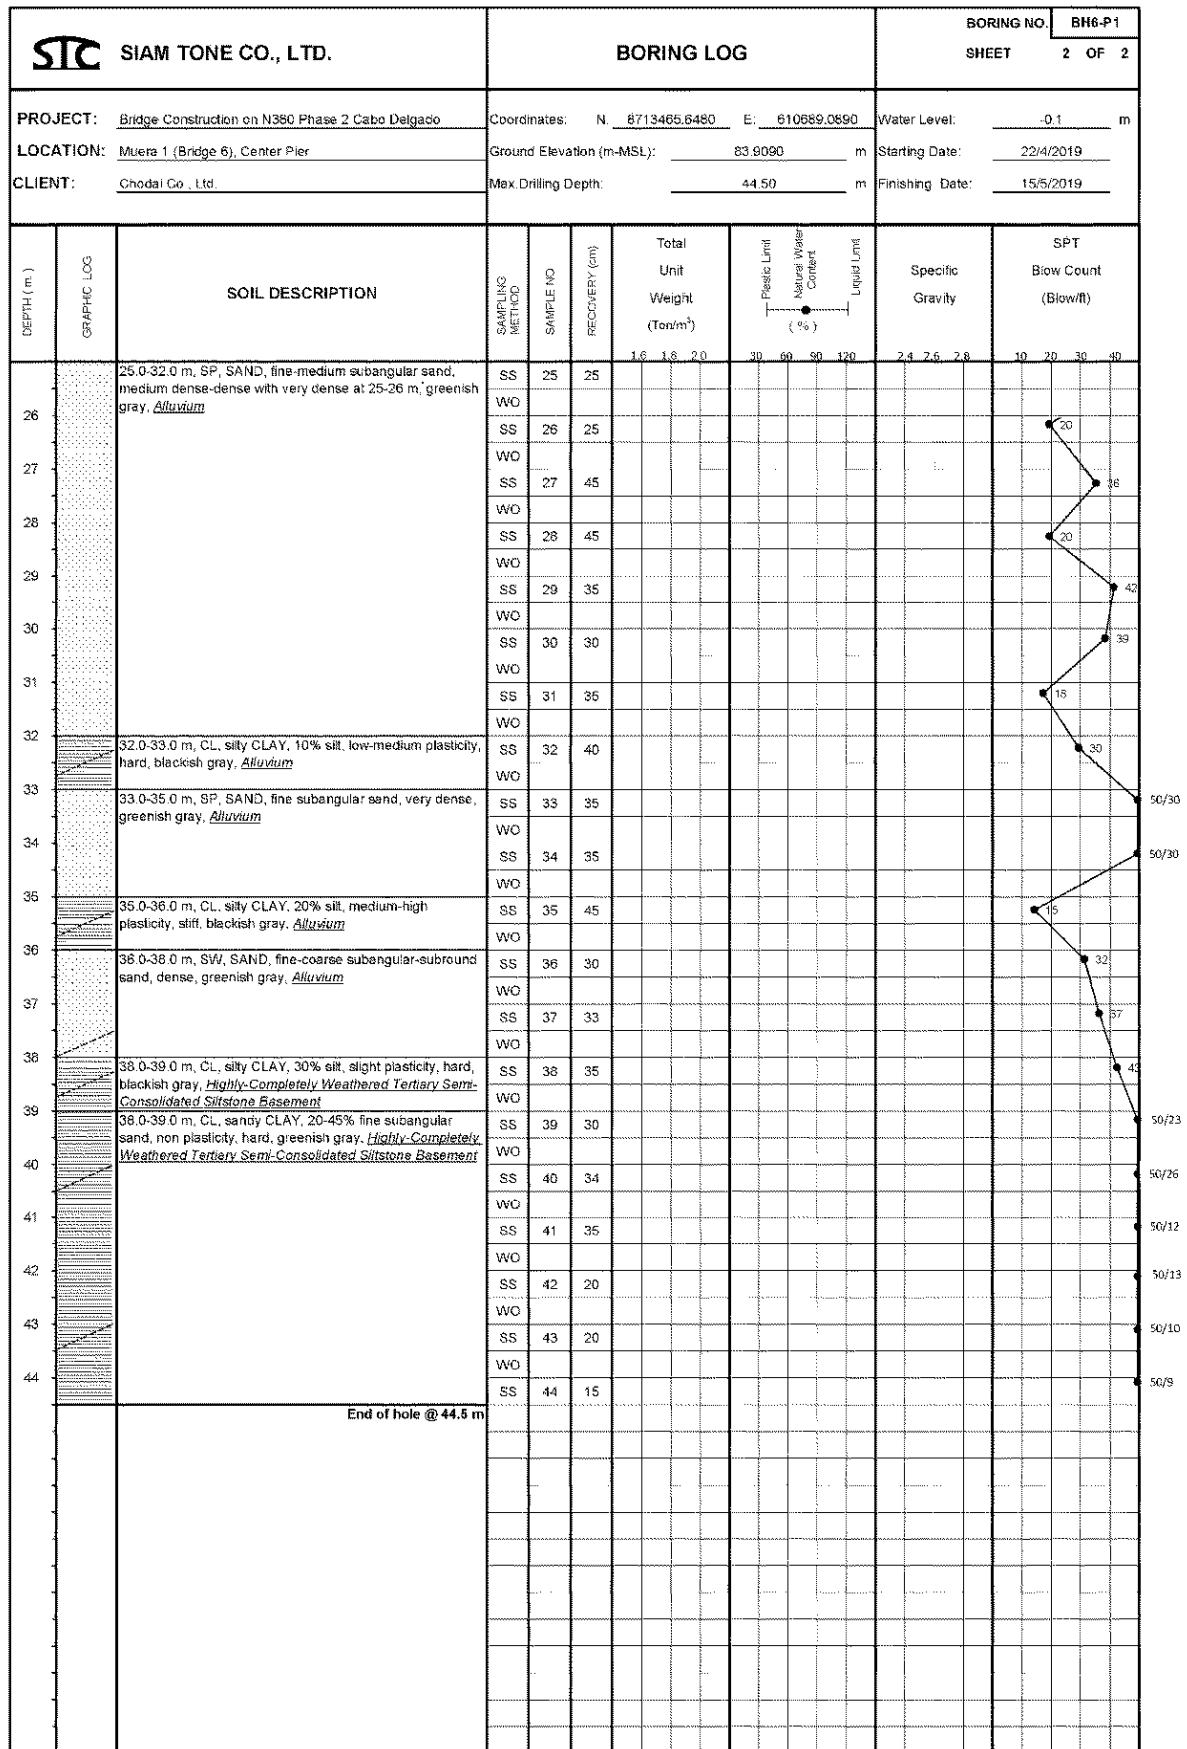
BH6-P1 at Central Pier of Muera I Bridge (B6)
